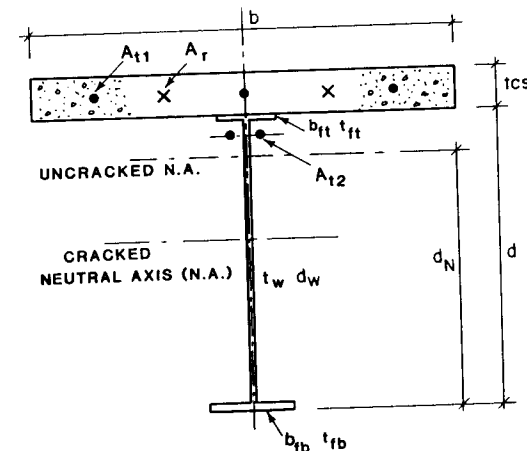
Typical Cross Section of Girder at Negative Moment Location
